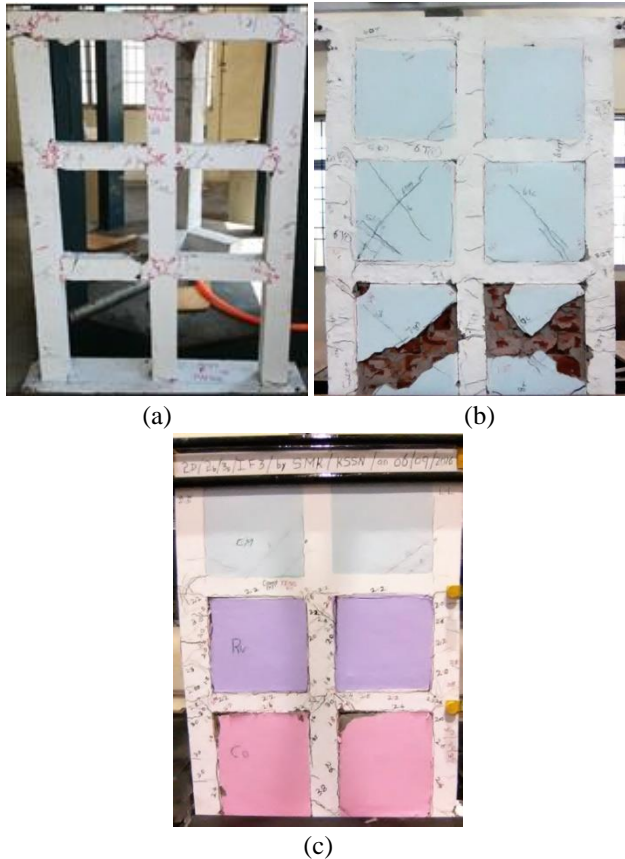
Deformed profile of (a) bare frame and infilled frame with (b) A1 and (c) A16 configuration
